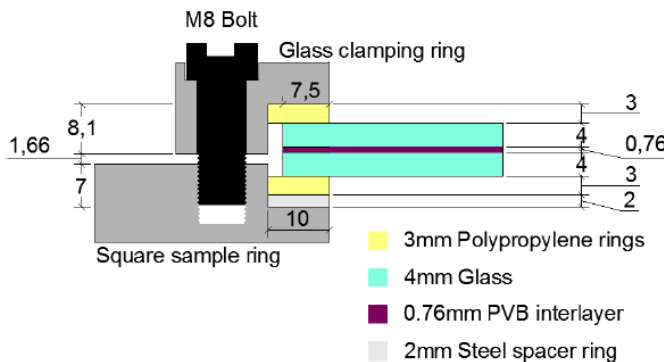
Clamping of test specimens I1 to I4 and I8.
